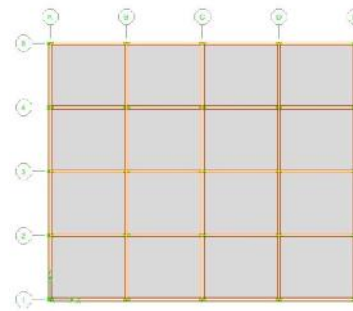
b: Plan of Model -2 (Stiffness of walls considered)
